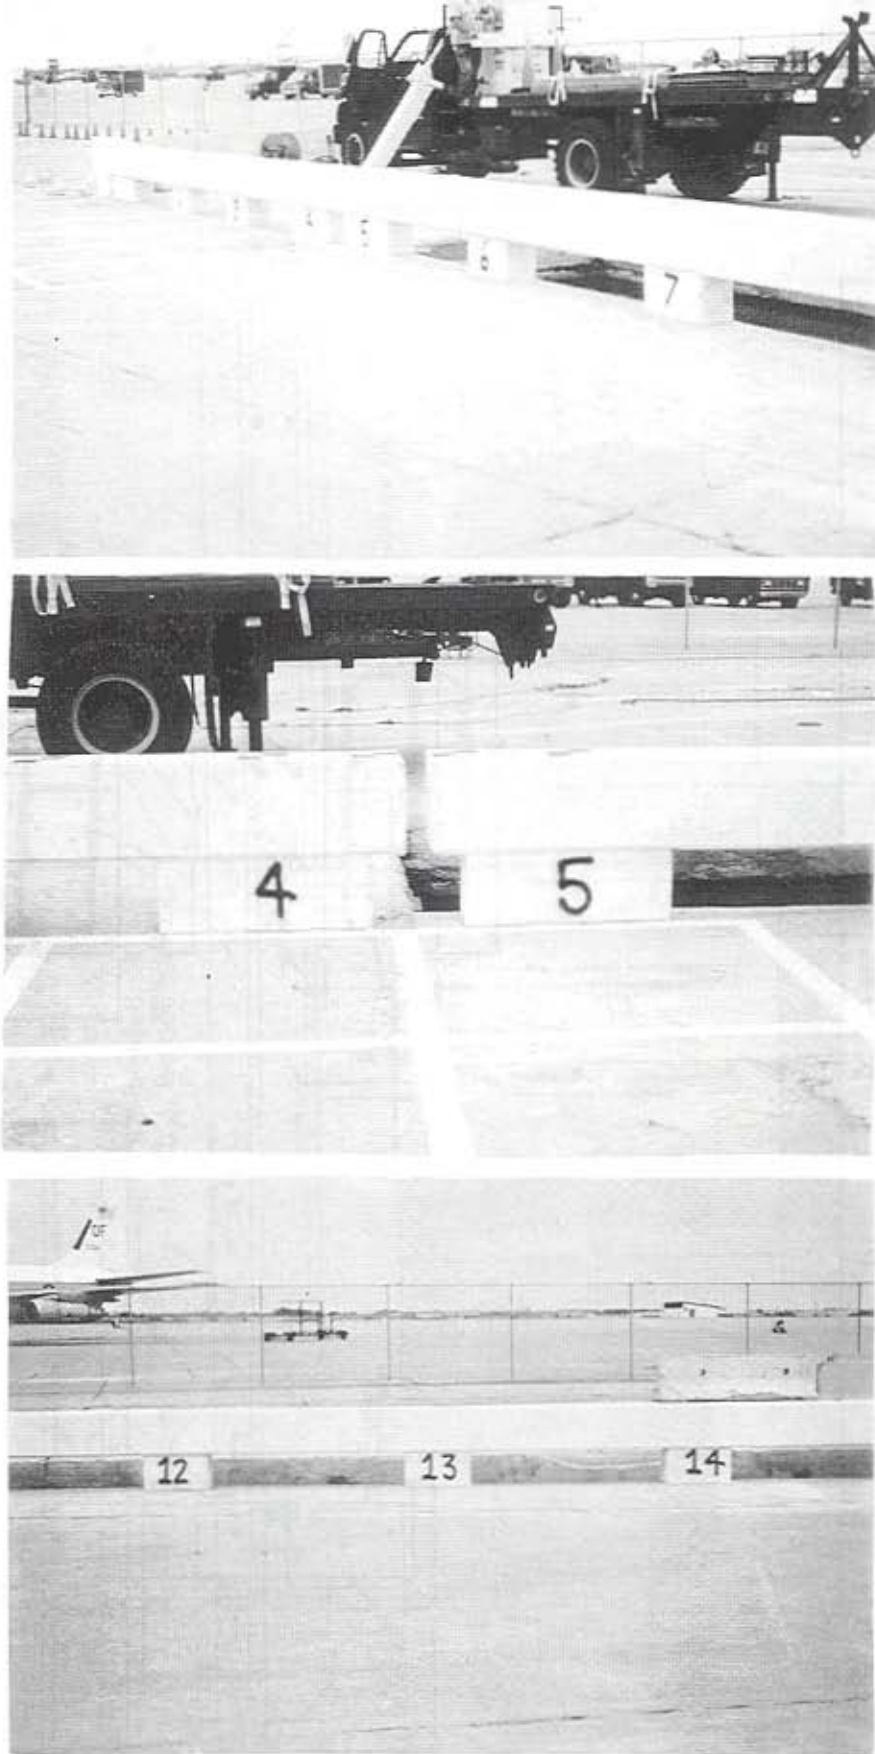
Photographs of Nebraska Open Concrete Bridge Rail.
